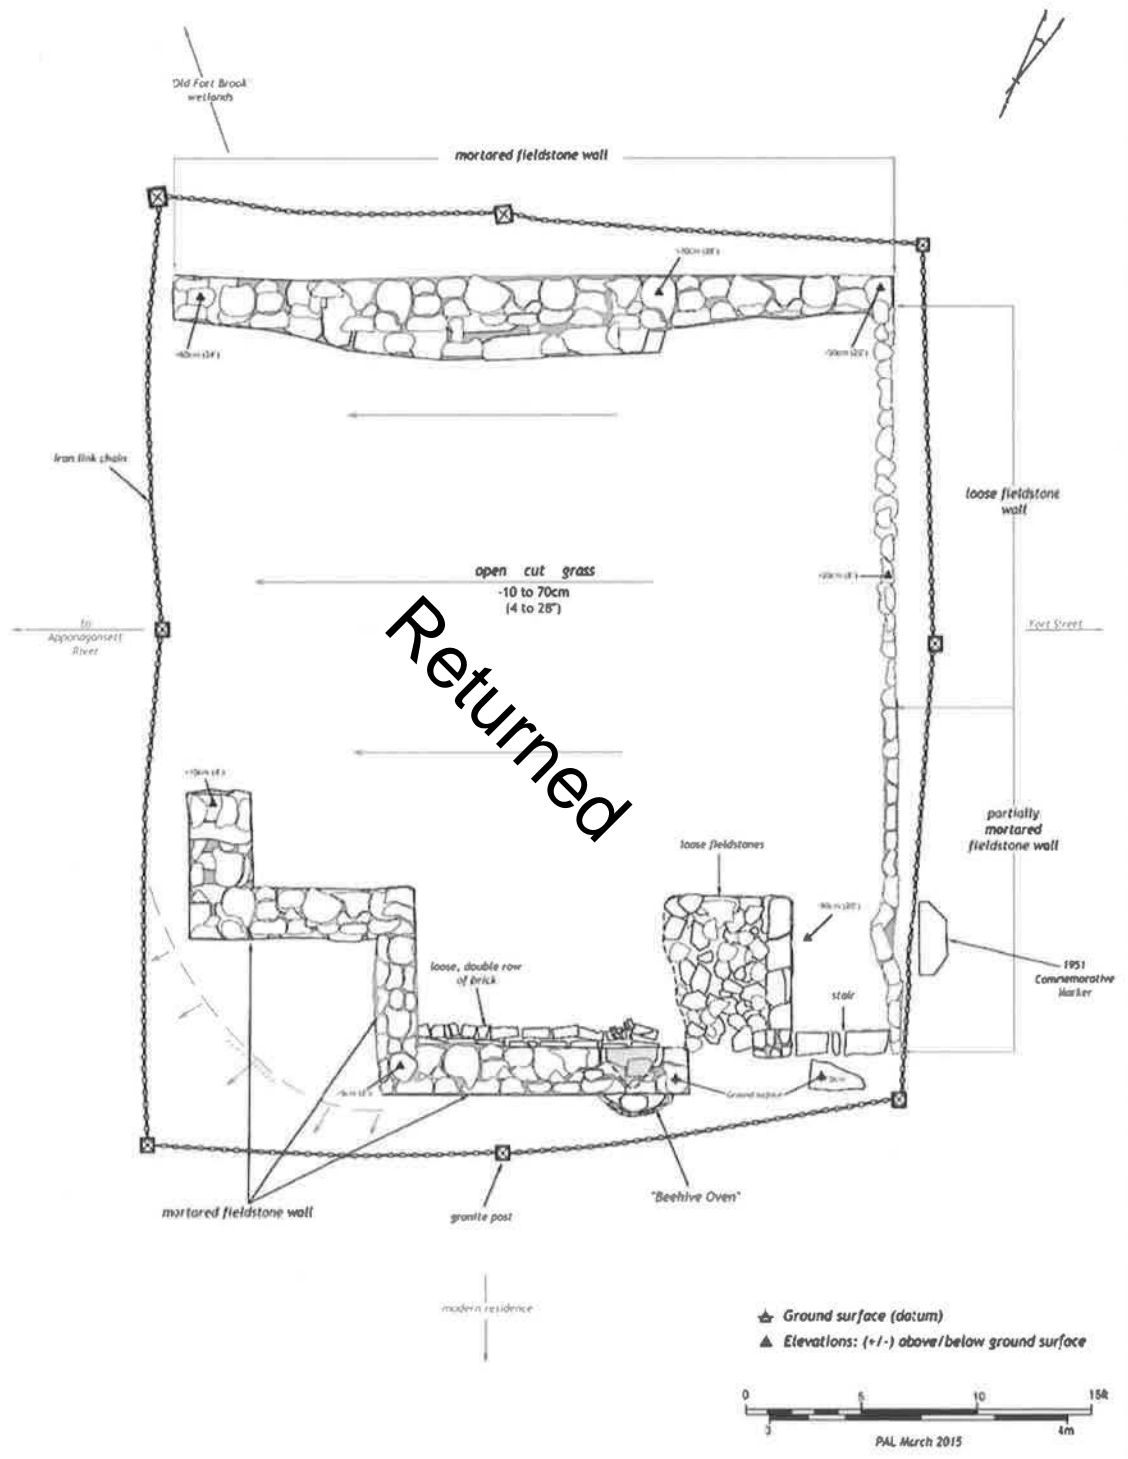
Site plan showing existing conditions, Russell Garrison Site (PAL 2014).
